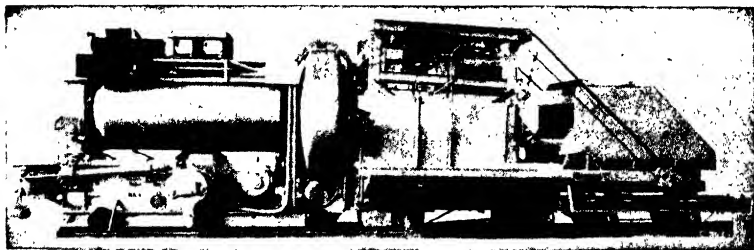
Combination of tunnel mixer and Pumperete machine, Montebello water tunnel, Baltimore. Dry batches are brought to the mixer in steel hoppers shown at extreme right, lifted off the car and raised as a skip for charging the mixer. The mixer discharges directly into the concrete pump. (Courtesy of Chain Belt Co.)
